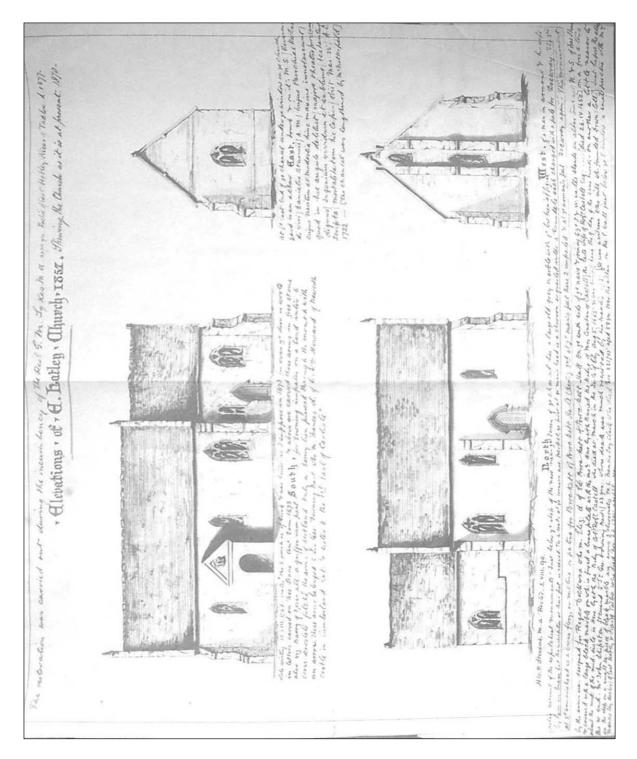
1857 Elevation drawings (*Courtesy of Downing College, Cambridge*)
